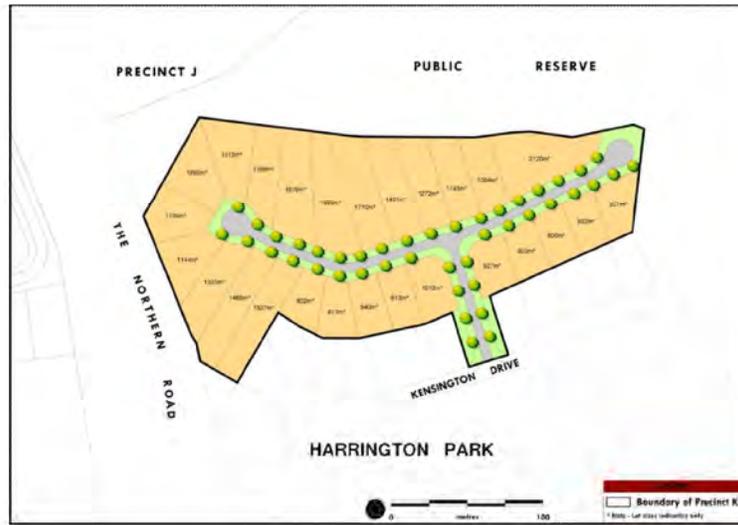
Harrington Grove Precinct K Indicative Layout Plan
